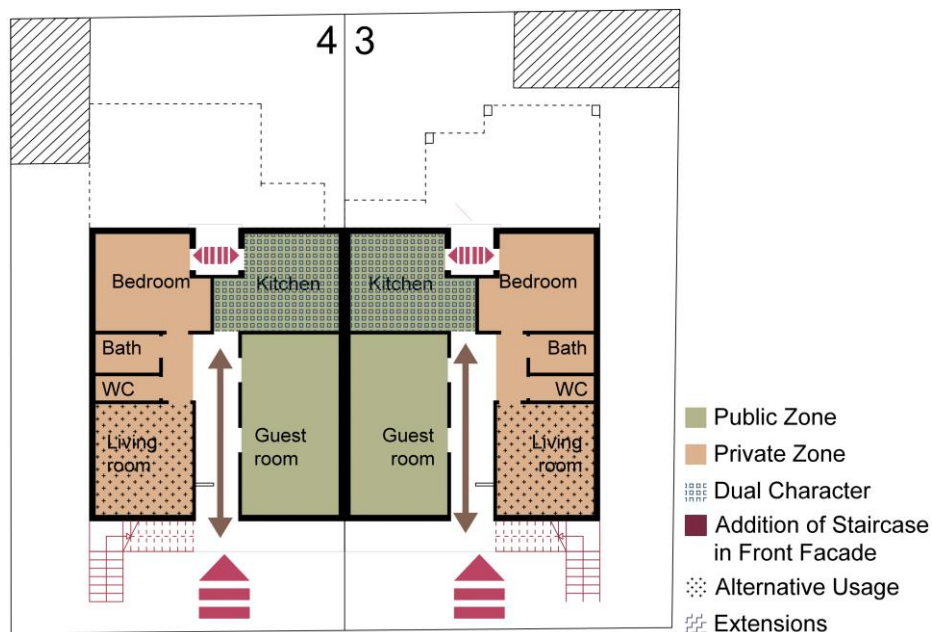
Samples of ground floor plans of original buildings with the addition of staircases in front façade (Author, 2017)
